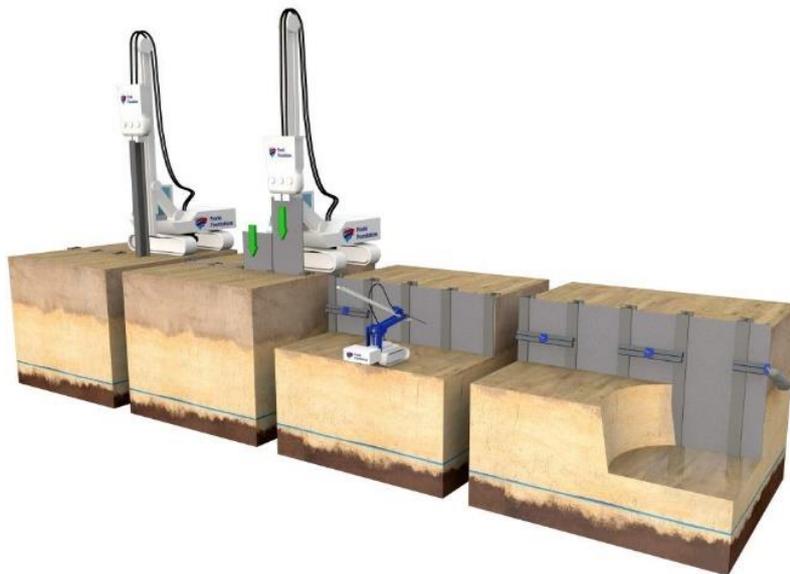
Berliner walls construction sequence (<http://www.ffgb.be/Business-Units/Retaining-Walls---Utilities/Berlijnse-wand-en-paroi-parisienne.aspx?lang=en-US>)
